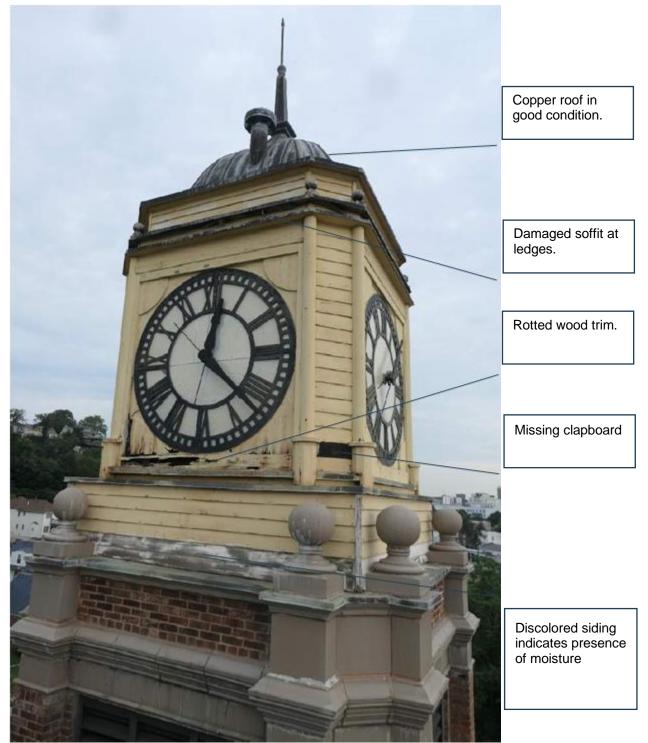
South elevation. Wood trim is rotted and in poor condition. Masonry is in good condition.
